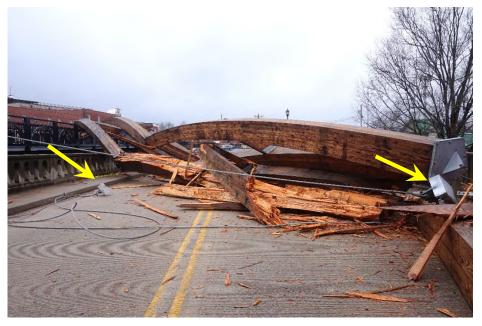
Southwest base connection. Anchor bolts pulled out.
